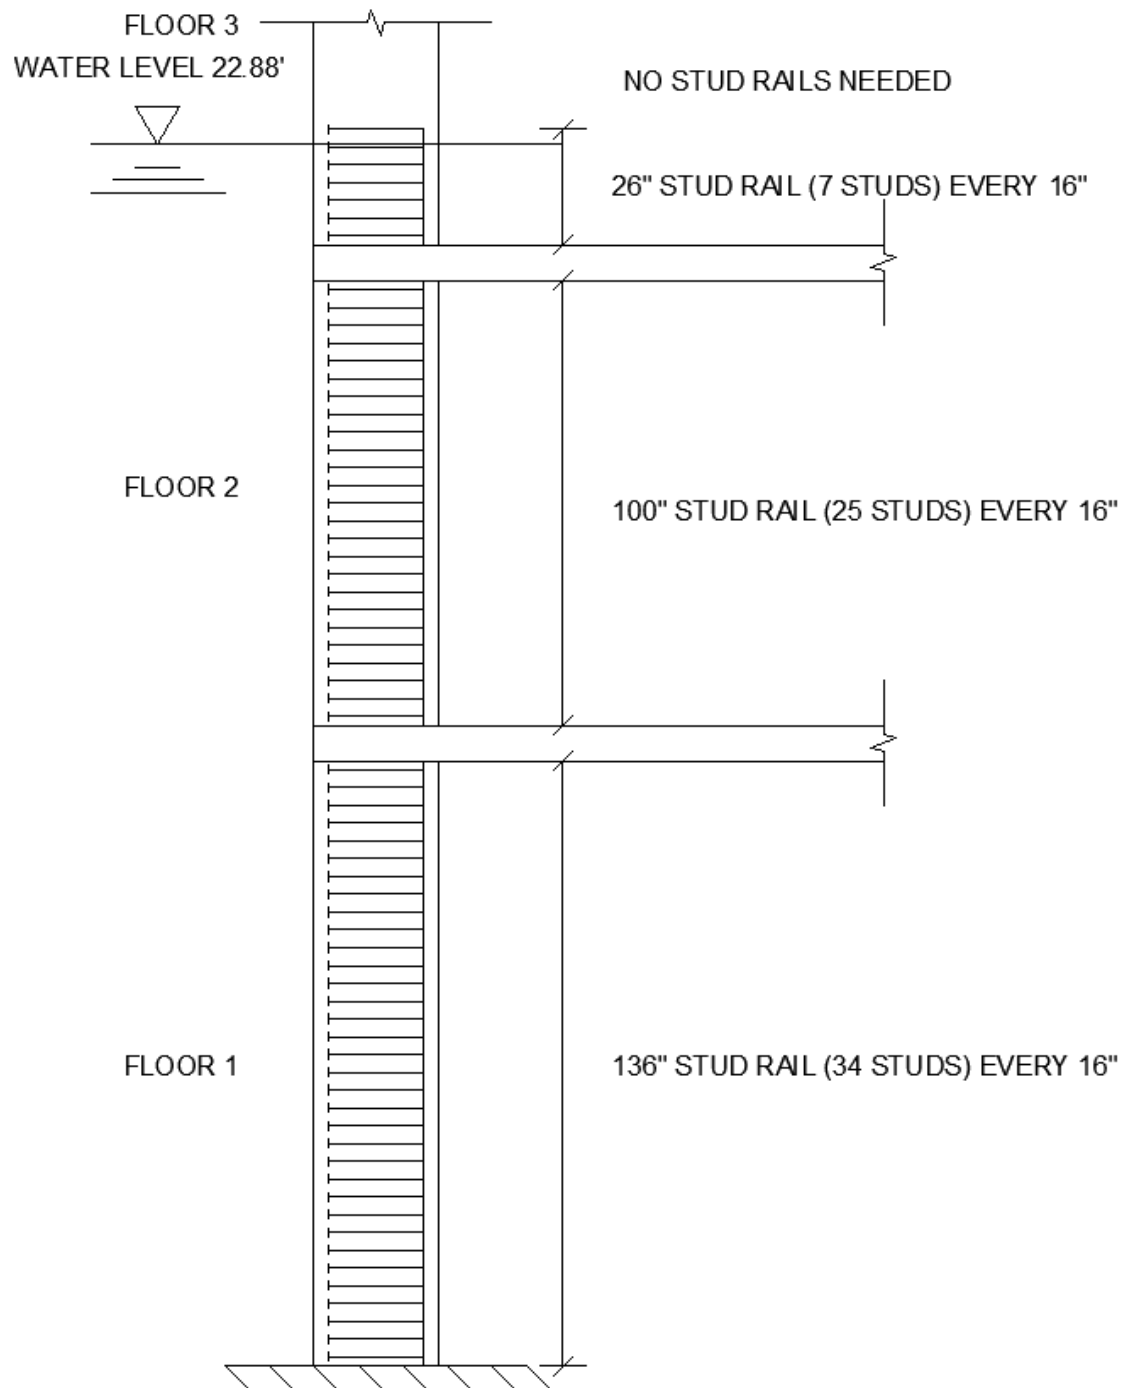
Stud Rail Diagram for the Floor 1 – 3
